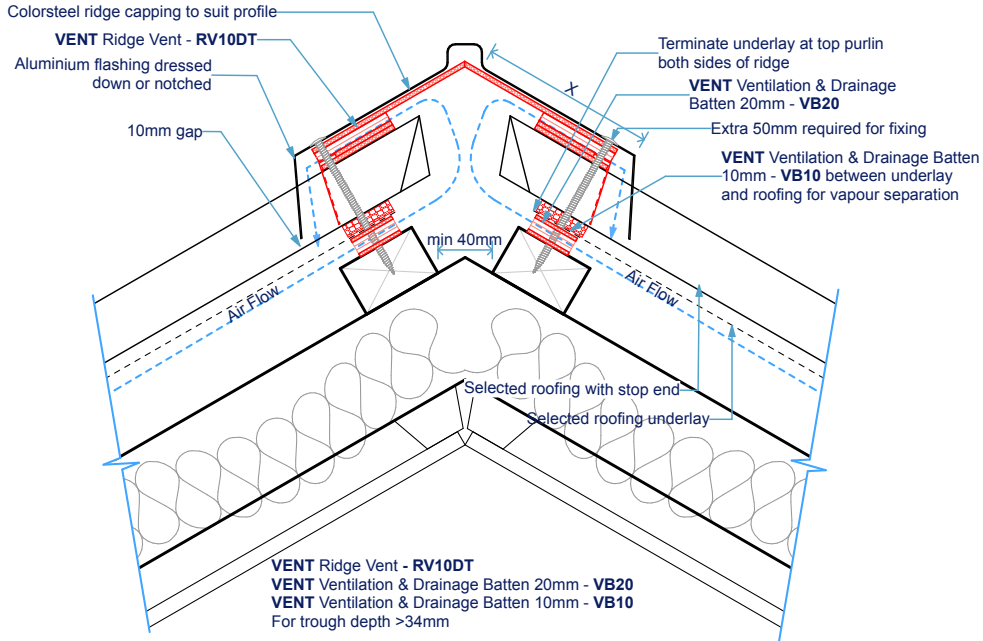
DT Application to Pitched Skillion Roof (any degree pitch)
